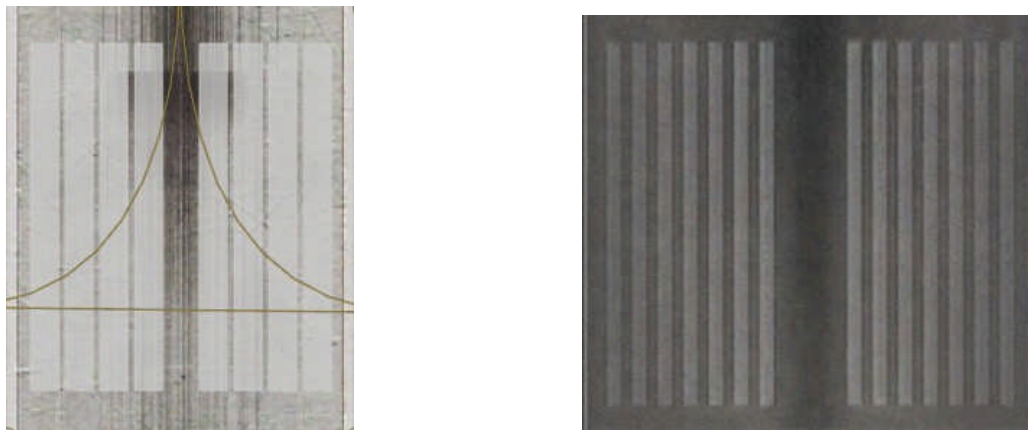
On the left a 100 foot wide runway, on the right a 150 foot wide runway.
